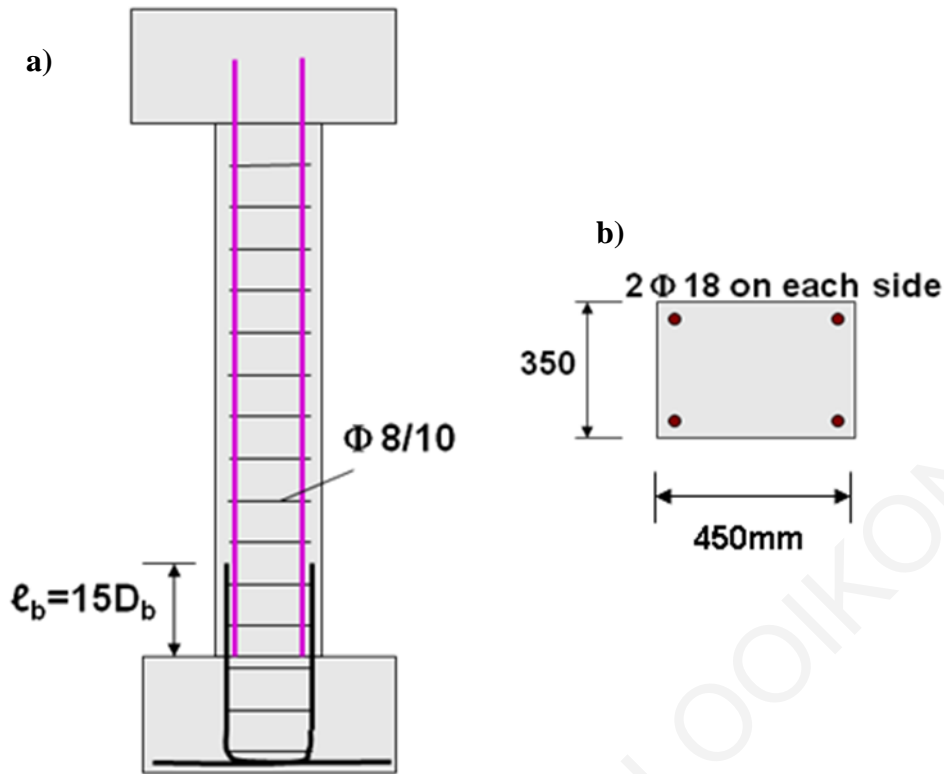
a) Example reinforced concrete column under consideration and b) column's rectangular cross section.
